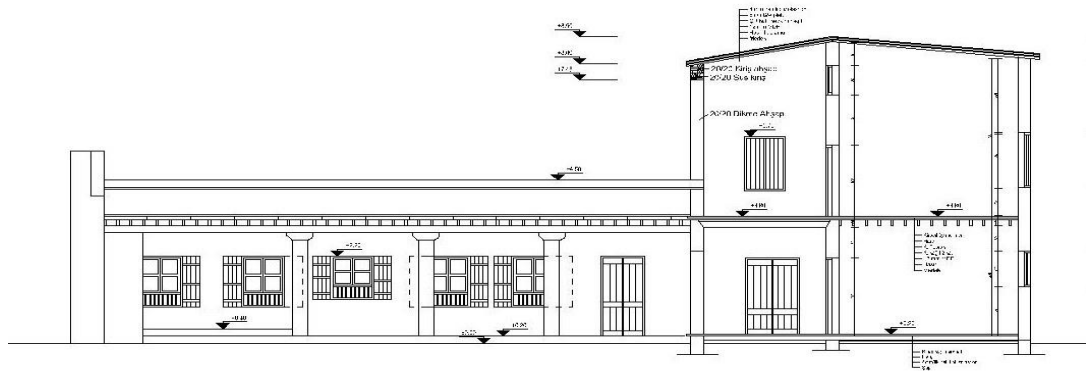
The section of the female part of the building (with a view windows and wall doors of the Chimney House); (Department of Antiques and Museum)
